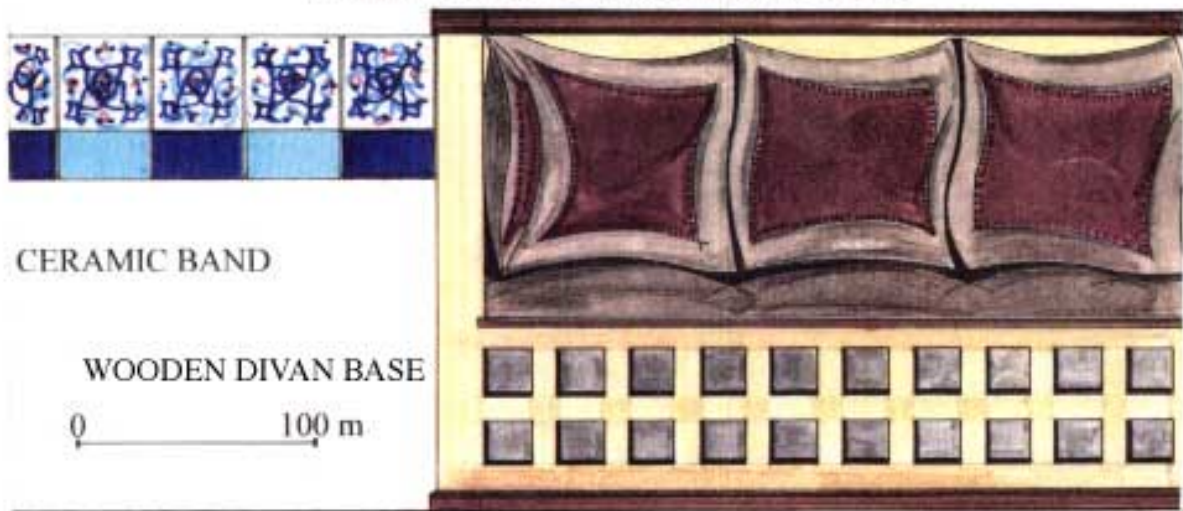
Proposed design for modular divan unit and wall ornamentation.
